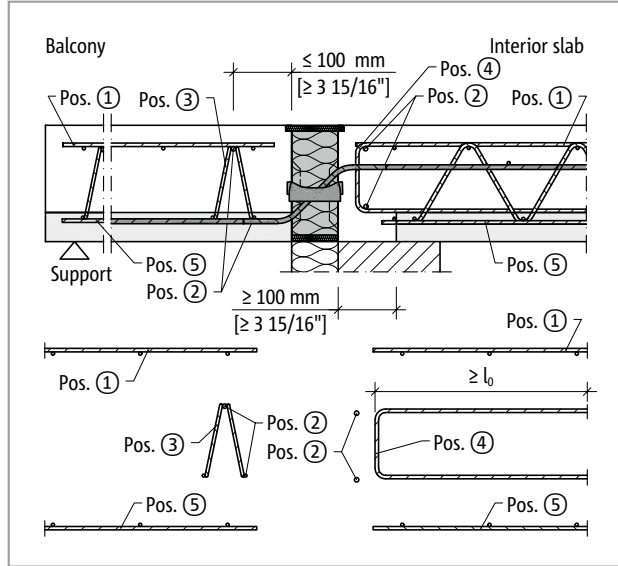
Schöck Isokorb® T Type CQ-V6 to CQ-V10: On-site reinforcement with lattice beam
